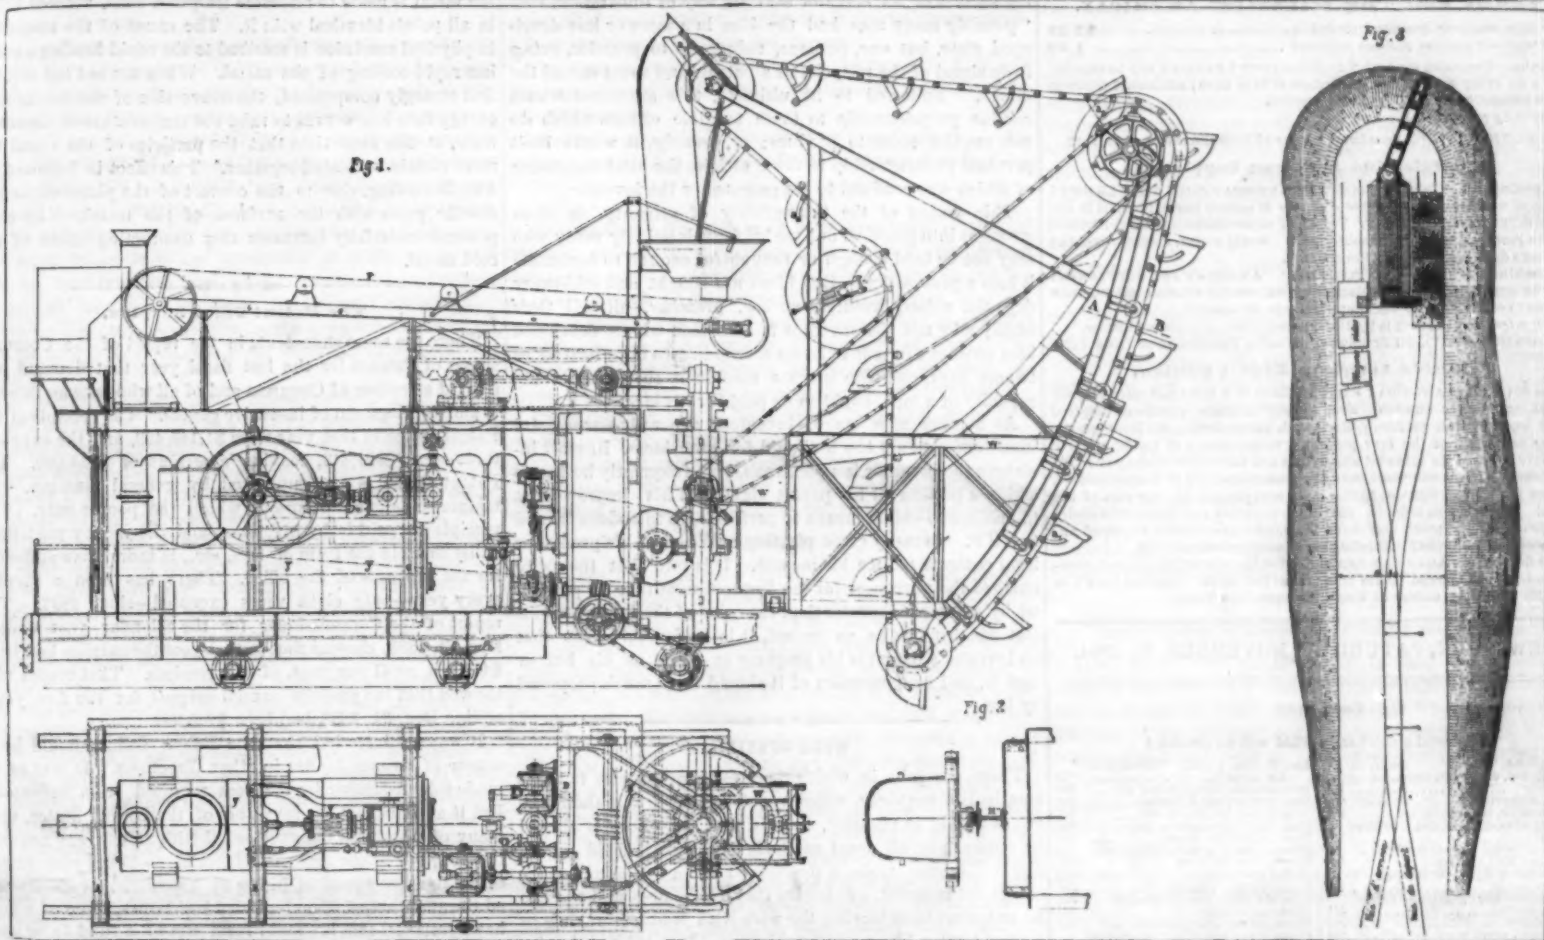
Details of the Apparatus. (Plan and elevation, on a scale of 1-40.) Fig. 2.—Plan of Bucket and Guide (Scale 1-30). Fig. 3.—Arrangement of Track (Scale 1-300)
